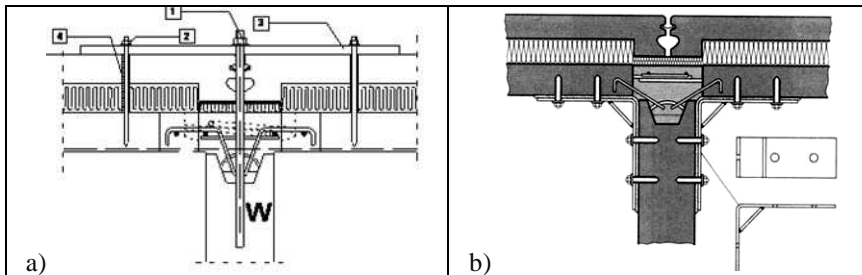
Strengthening of vertical ZWO-W-ZWO type joints: a) alternative solution realized from the outside [15]; 1 - screw fastened to the W type wall, 2 - screws fastening the resistant element to the load-bearing layer of ZWO type wall, 3 - resistant element - steel flat bar (instead of C-shaped cross-section), 4 - distance-marking case (instead of concrete cork), b) strengthening realized from the inside of the building using angle plates [18]
